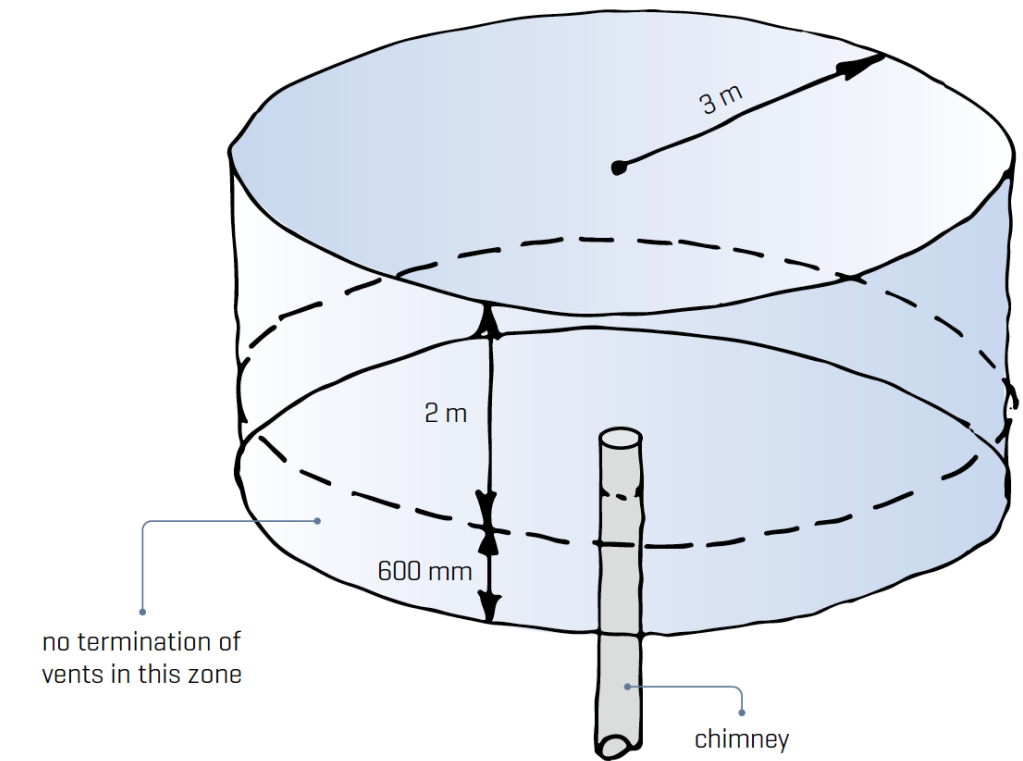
Termination point of vent 2 m above, 600 mm below and 3 m horizontally from a chimney.
